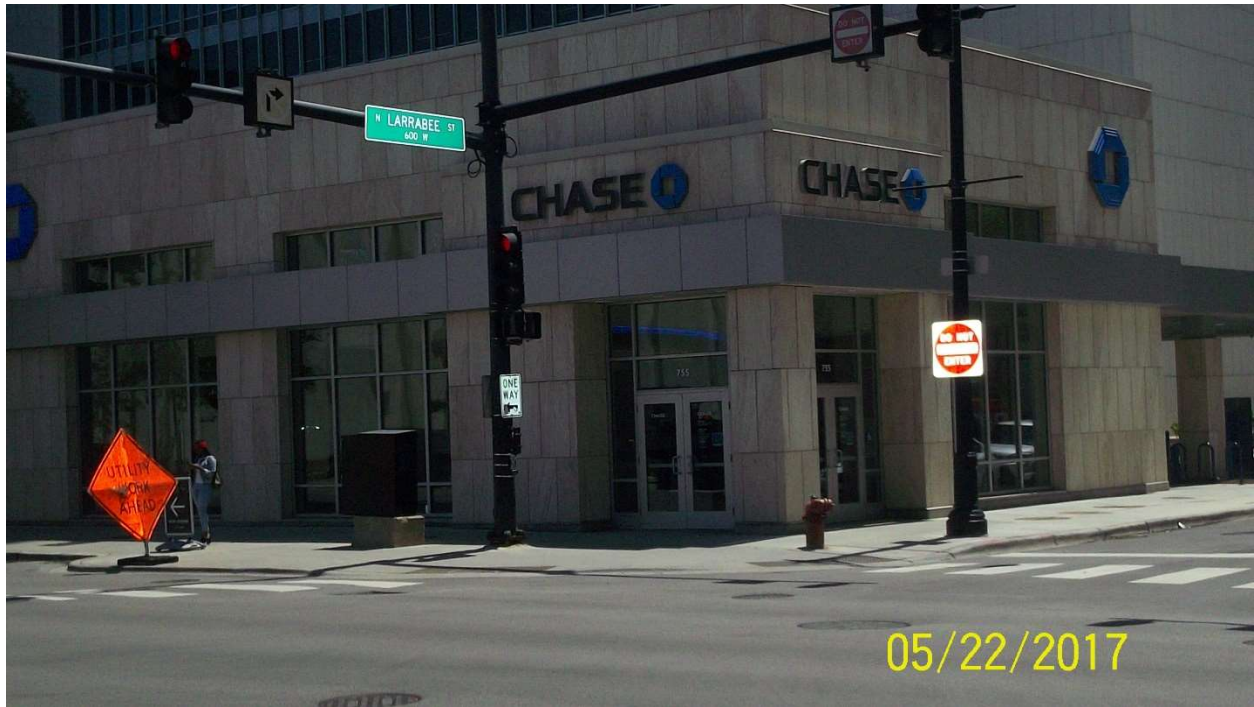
Northwest corner of Chicago Ave. / Larrabee St. – Looking Southeast
